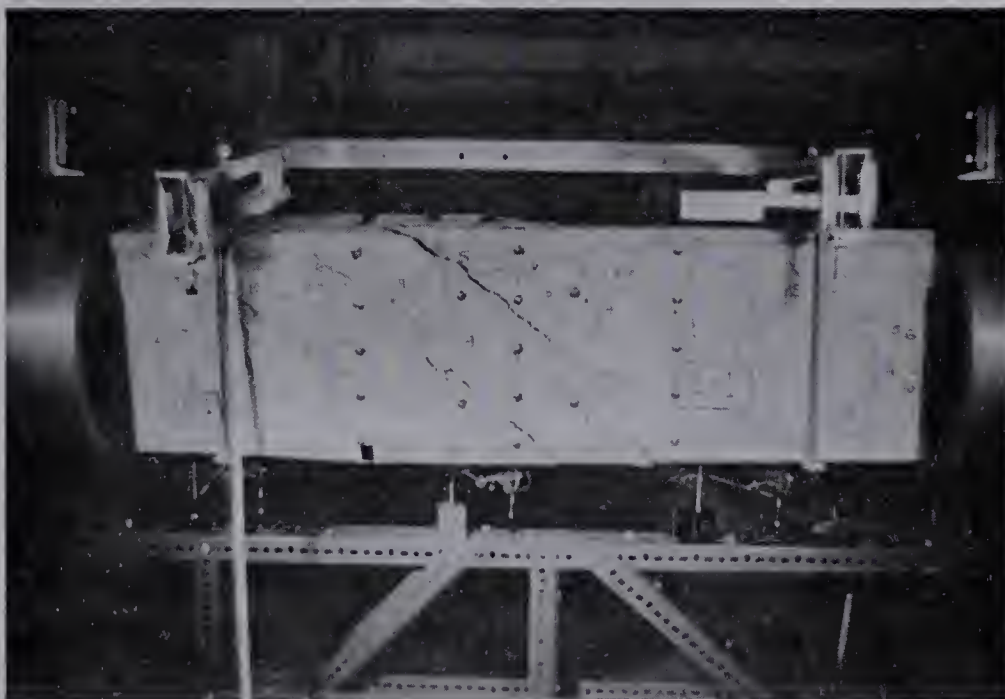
CRACK PATTERN FOR NORTH FACE OF BEAM E-1
